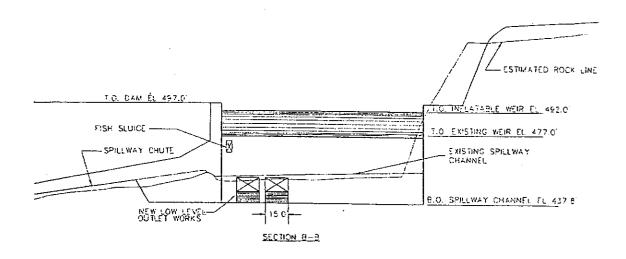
Skookumchuck Dam Spillway Modifications-Sections
